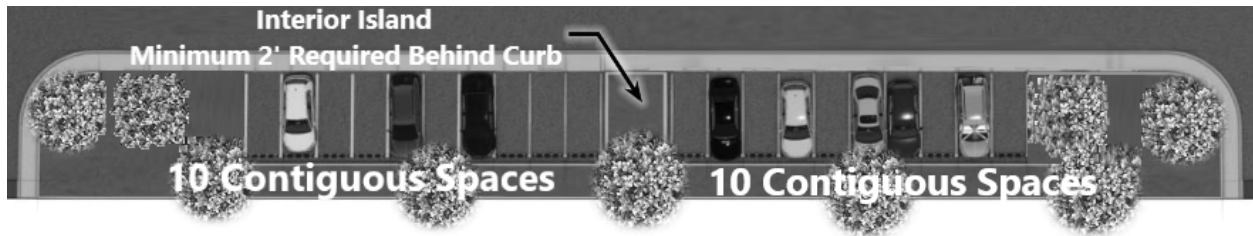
Terminal Island Landscaping Illustrative Example
